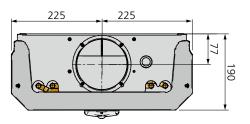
Dimensions ADRIATIC AWC Prisma, end view air connection
